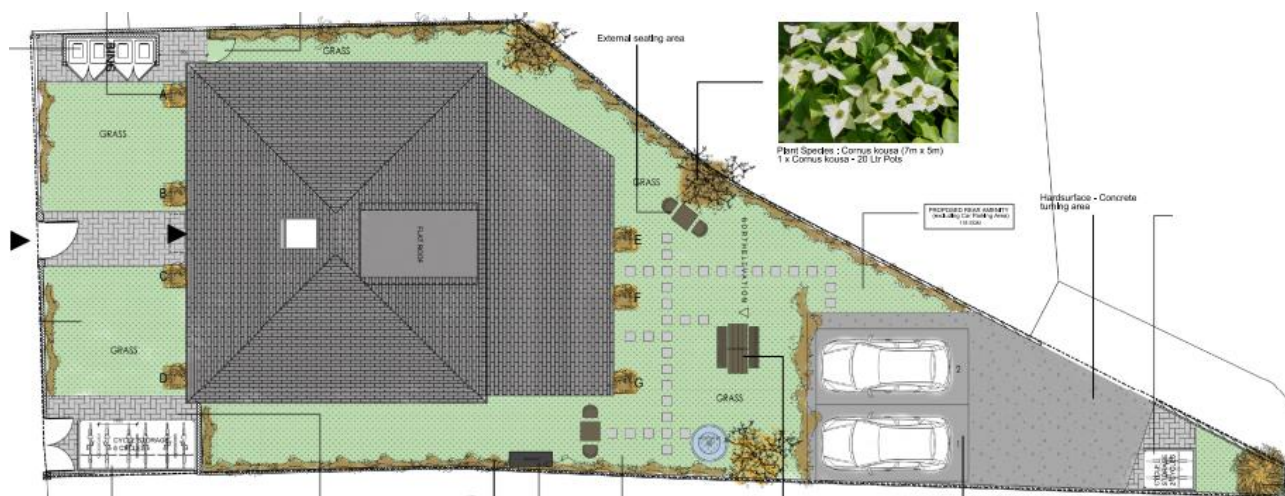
Extract from the landscape drawing showing the overall site layout (reference LAN-001) (not to scale)
